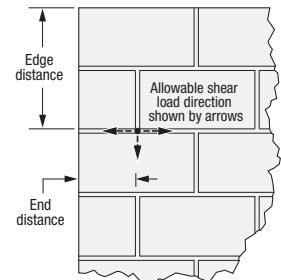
Anchor Placement in Grouted CMU Mortar "T" Joint
